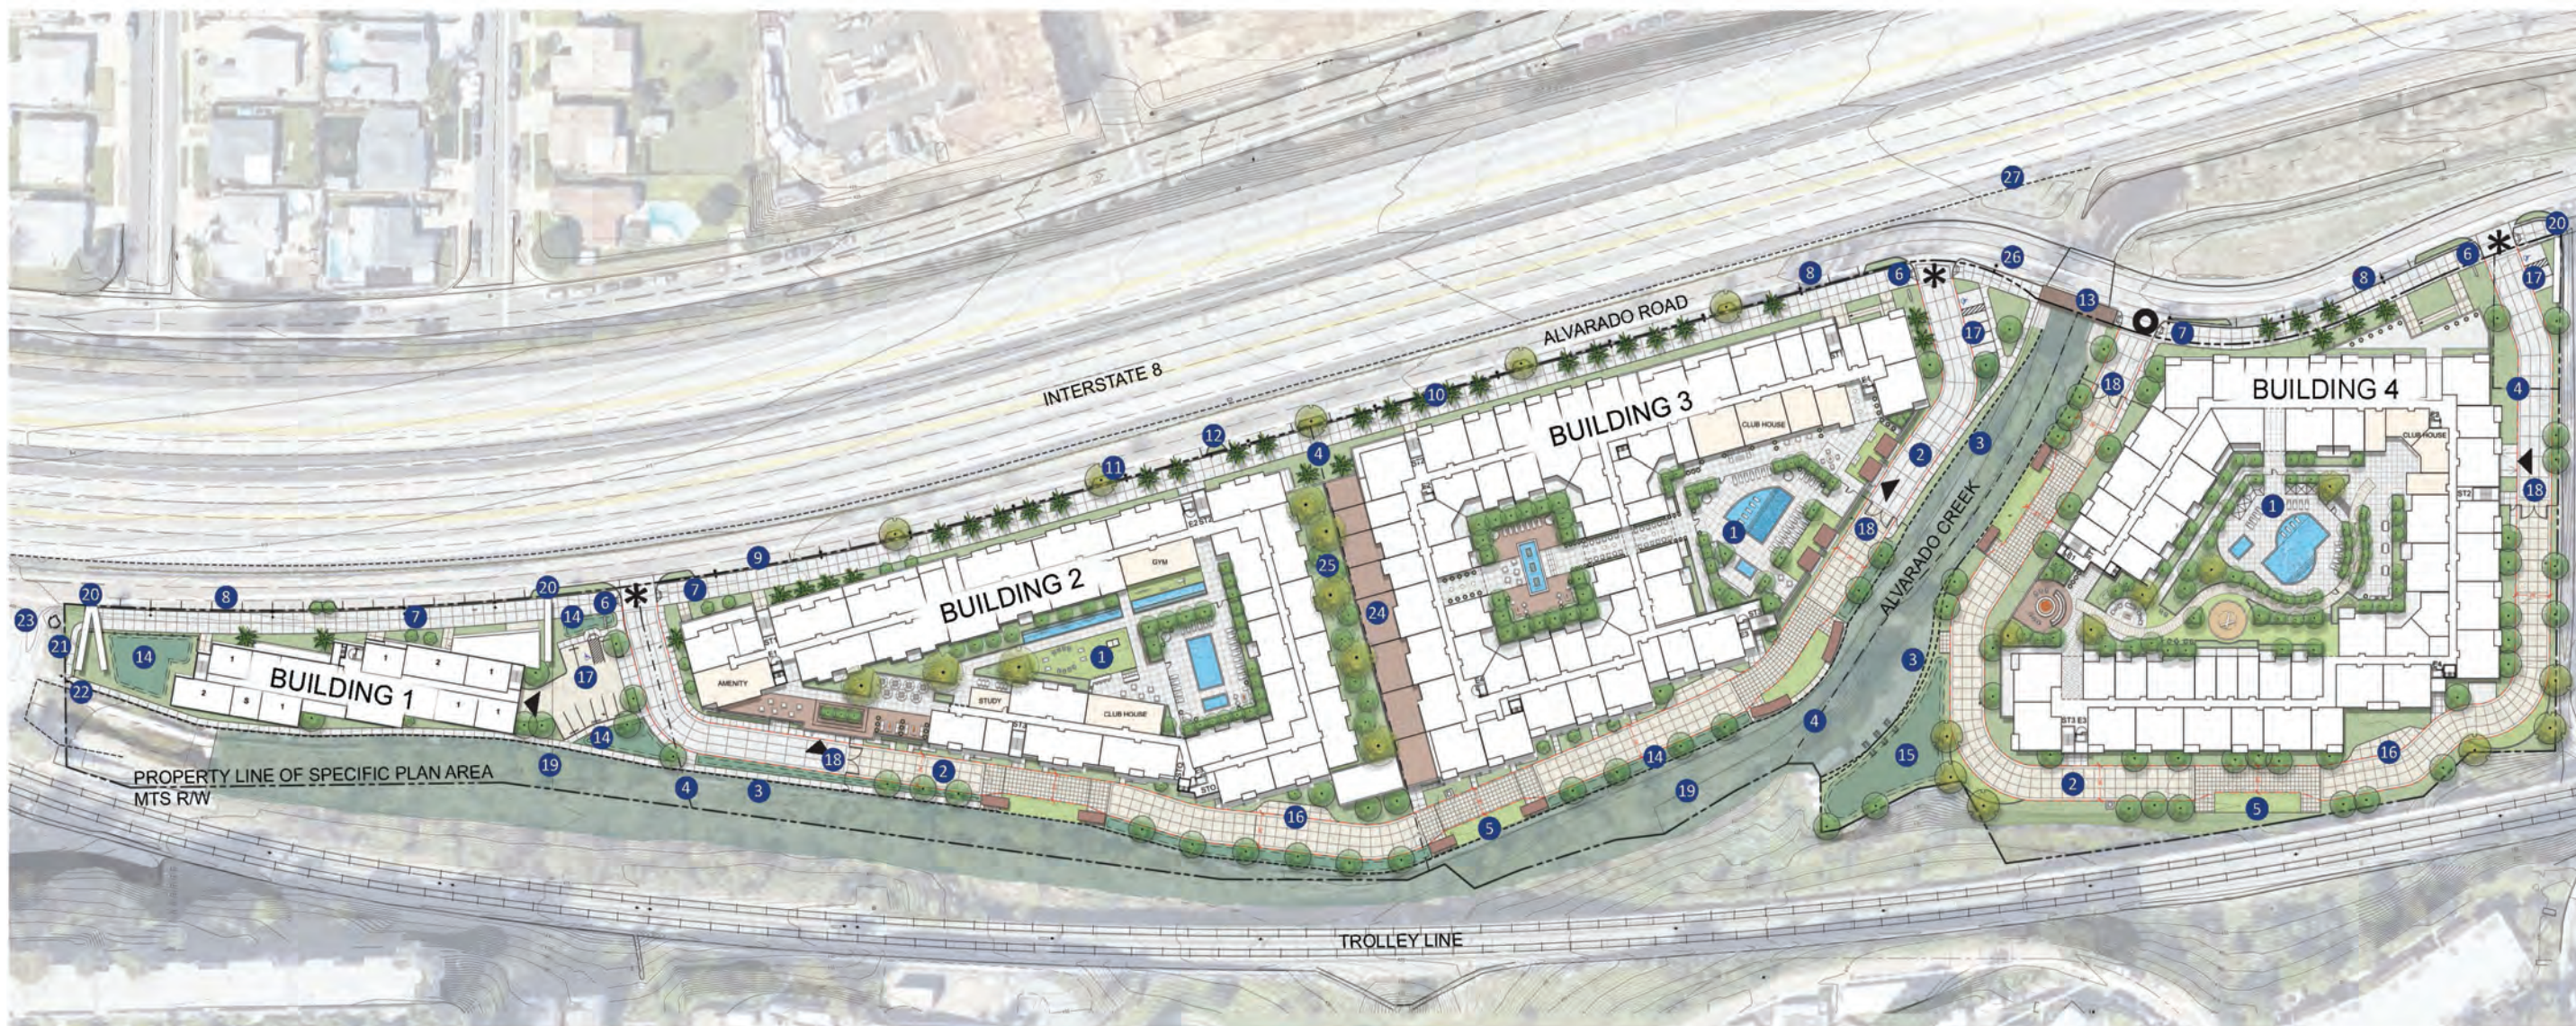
Alvarado Specific Plan Land Use Development Plan (with details identified)
